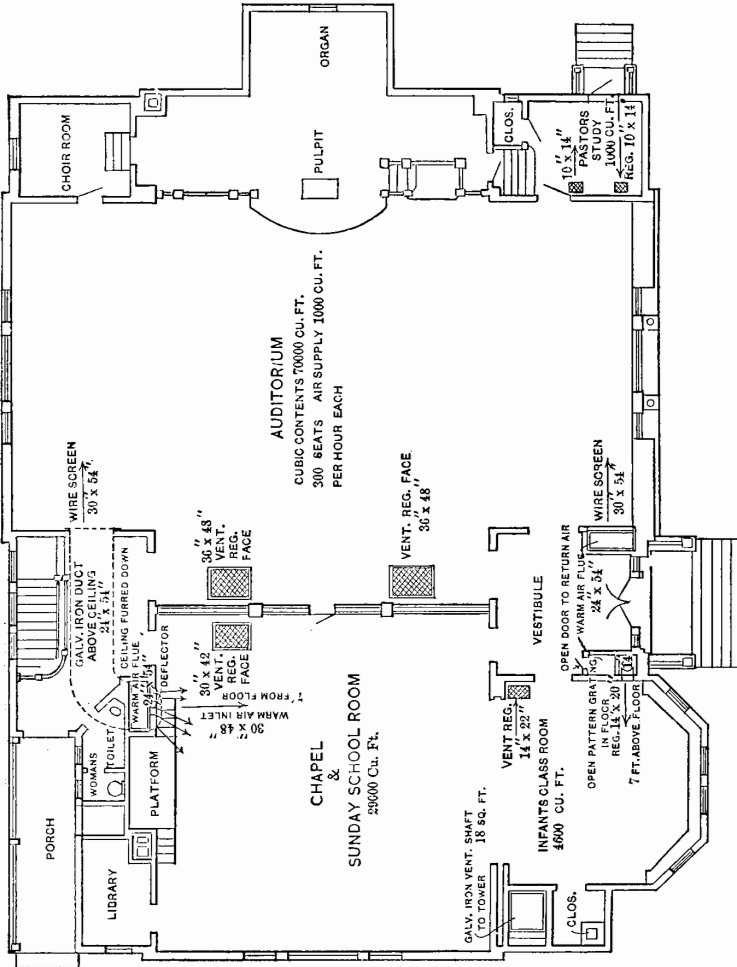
Furnace System of Heating and Ventilating a Church.—First-Floor Plan.
